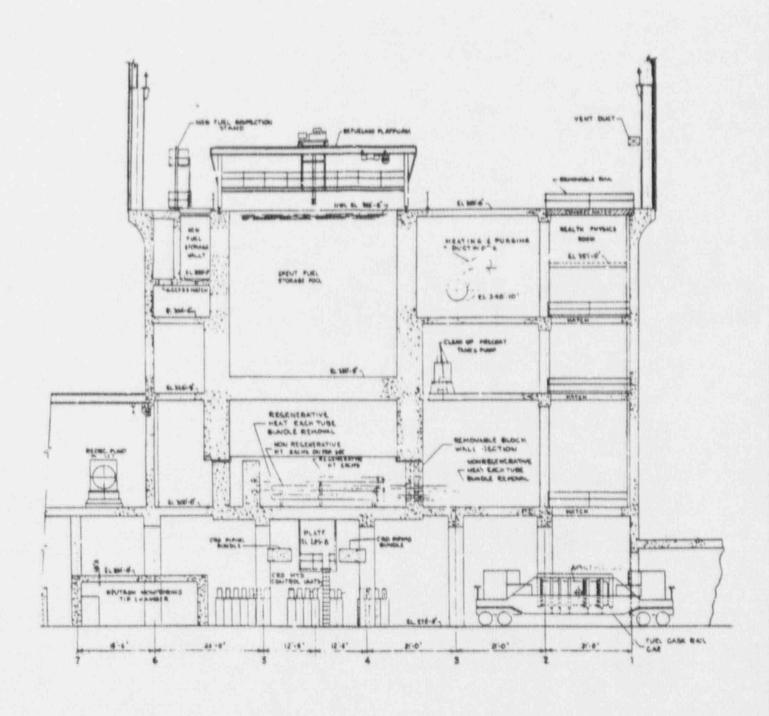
Fitzpatrick Reactor Building Elevation Views (page 4 of 5)
